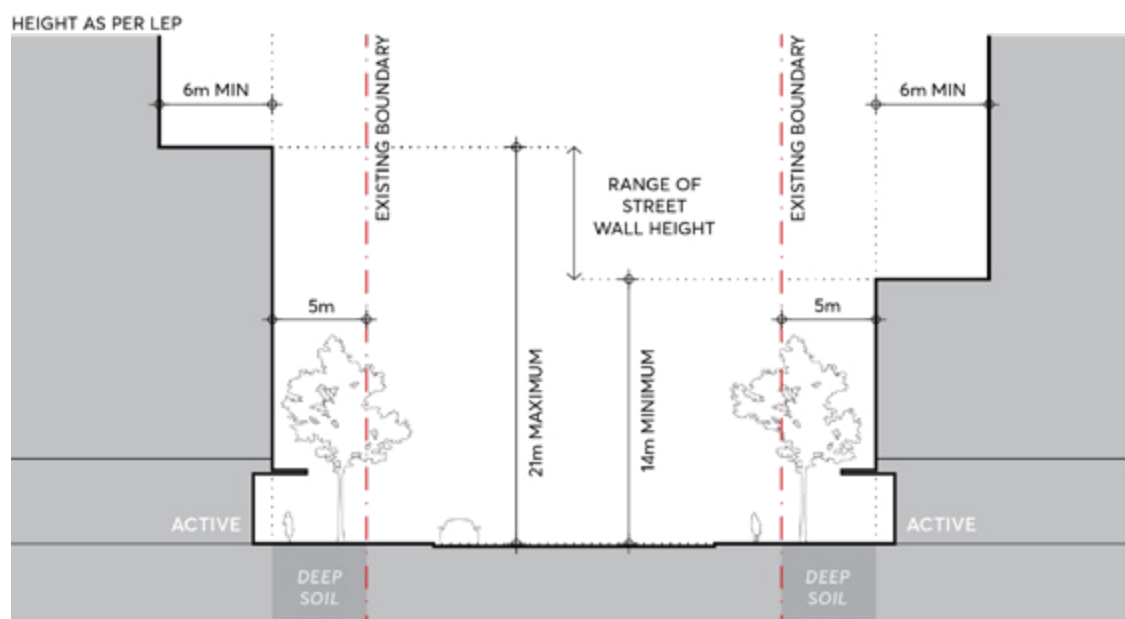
Church Street (Section A) Setbacks and Street Wall Height
